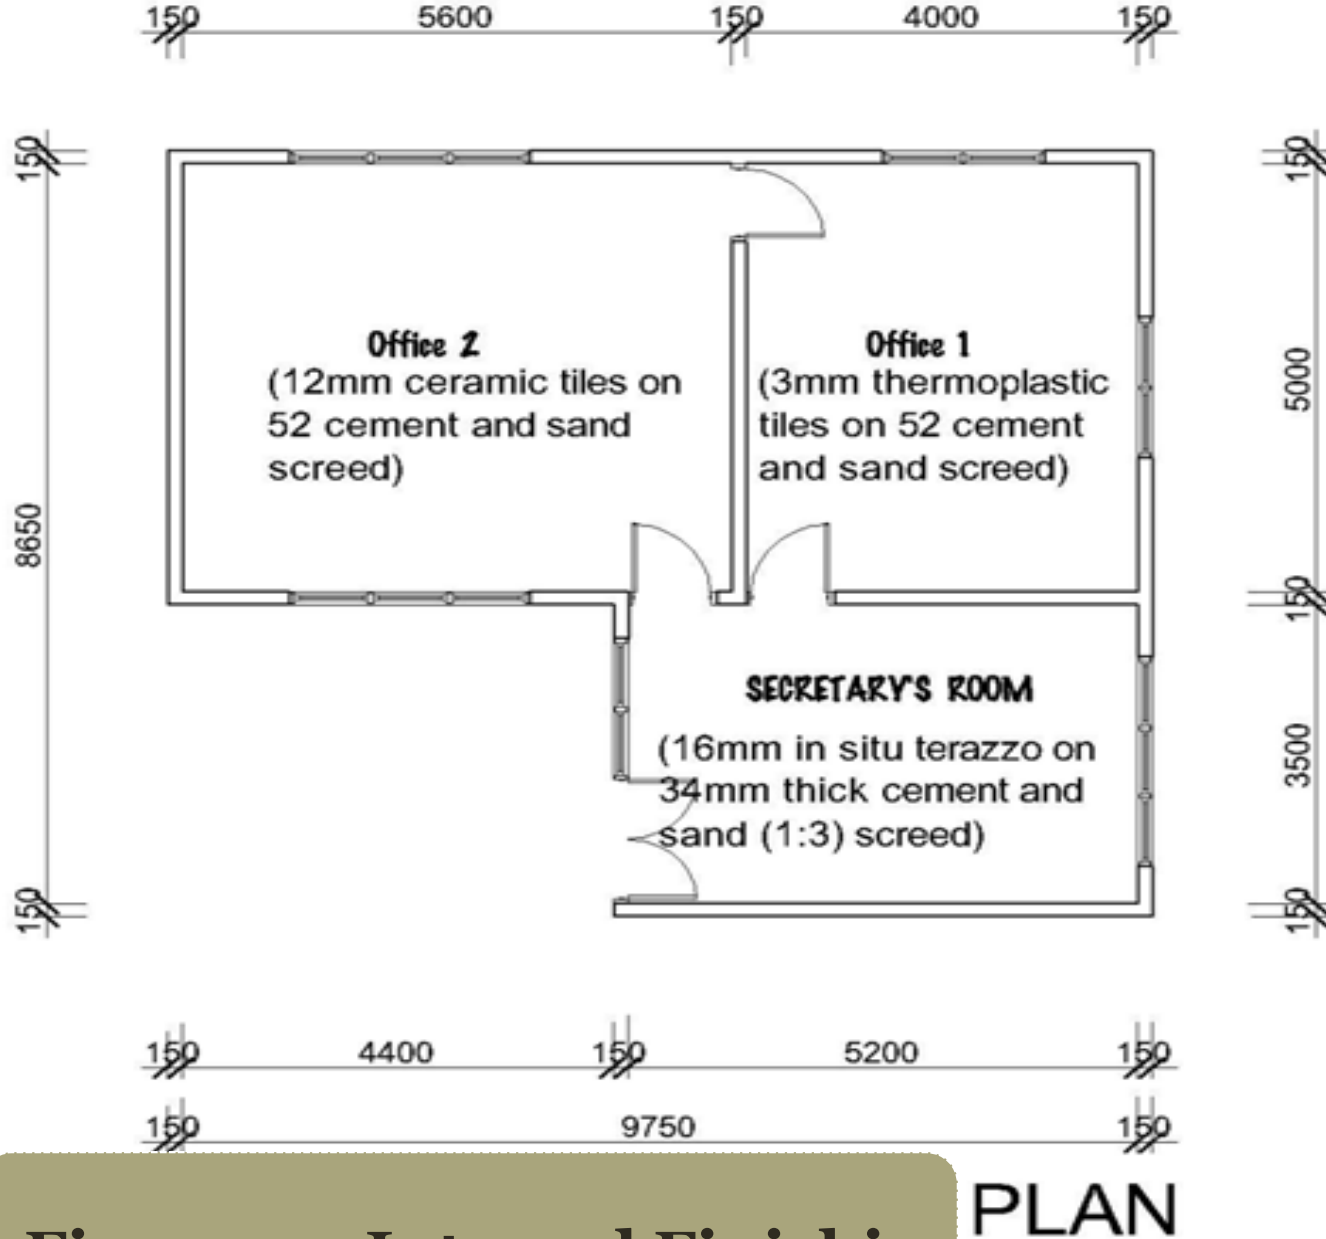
below shows the plan of an office block for A & Z Consult Ltd.
